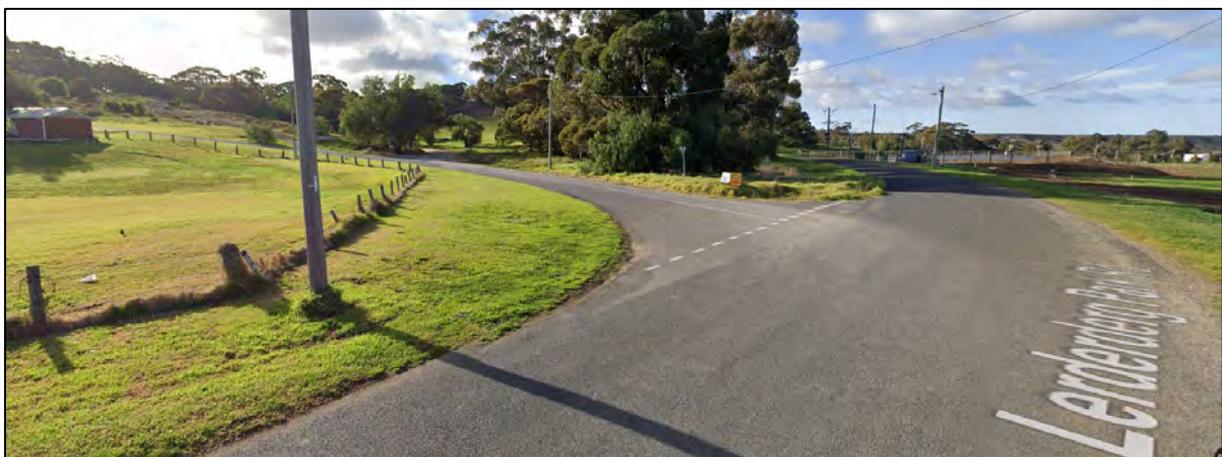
View Towards Oconnell Road From Lerderberg Park Road
